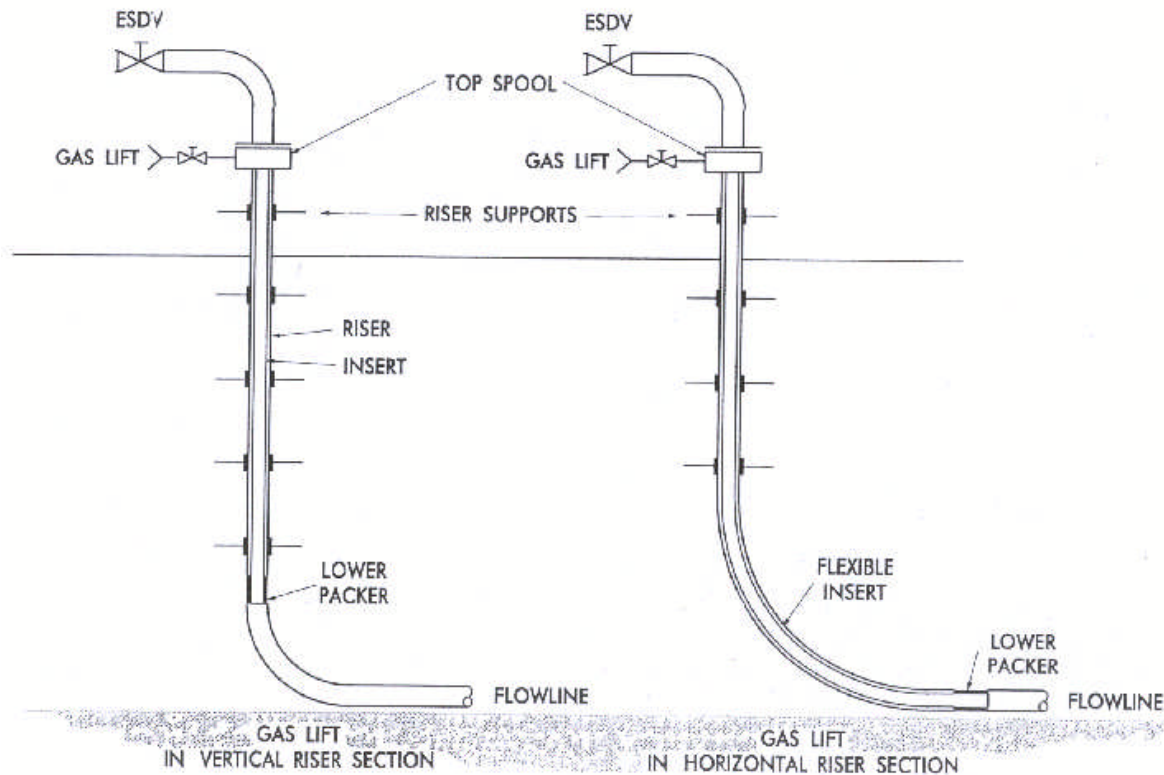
Schematic of Riser Layout with IRIS Installed. Wyllie (1994)
